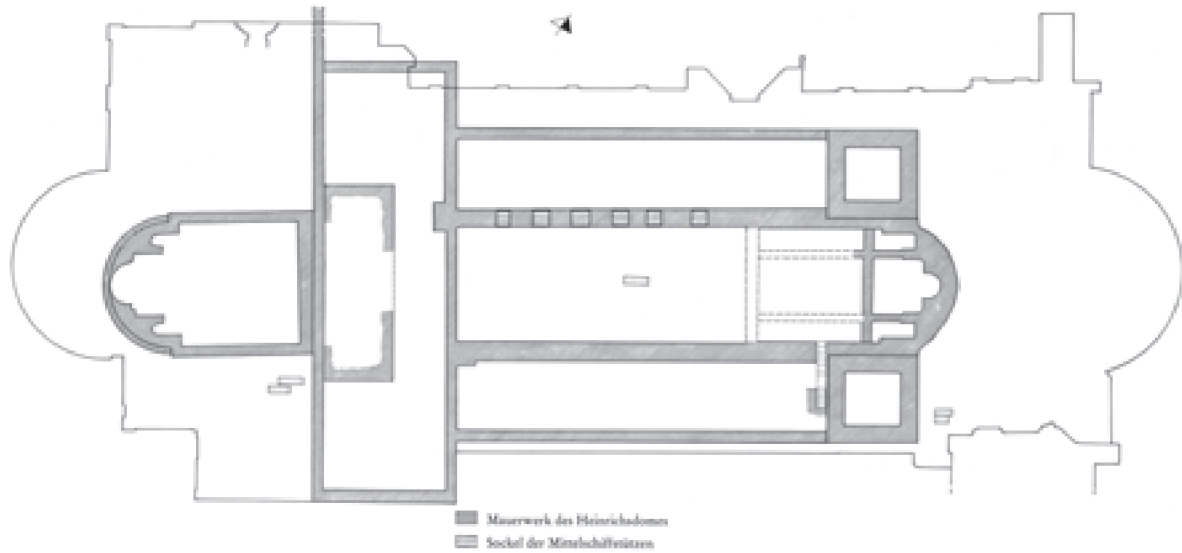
Bamberg, cathedral of King Henry II, ground plan (reconstruction Walter SAGE)
